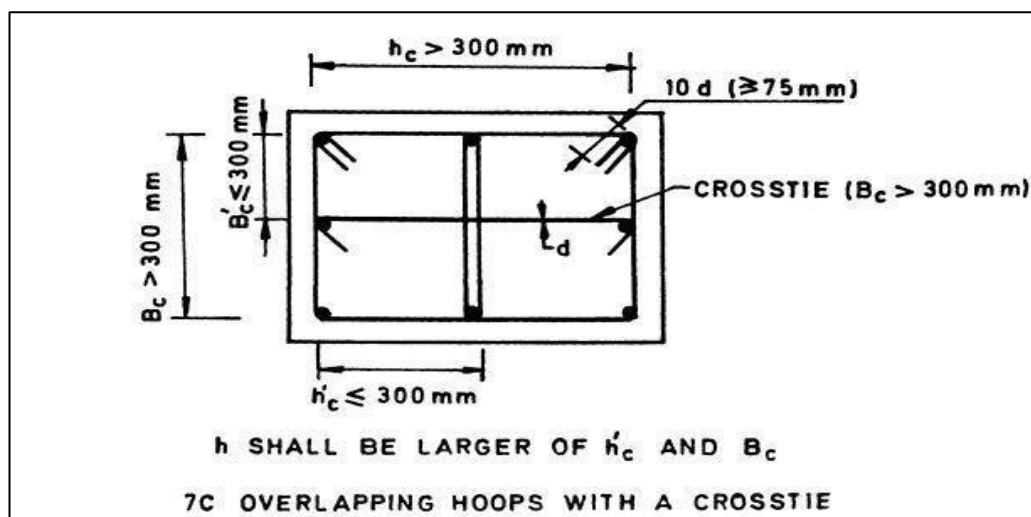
Shear Reinforcement in beams as per IS 13920 (2016)
